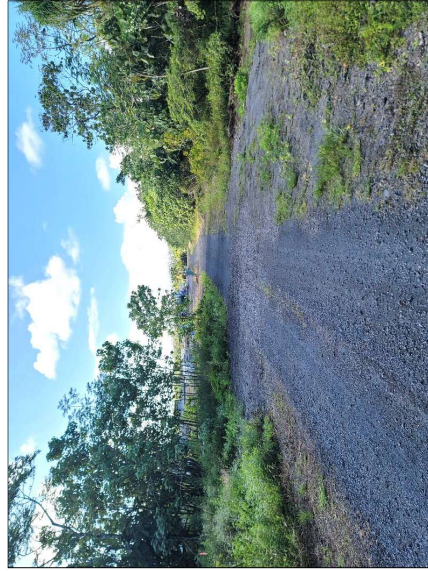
Photo overlooking the gravel roadway and adjacent graded areas located along the northwestern boundary of the plant property, view to south
